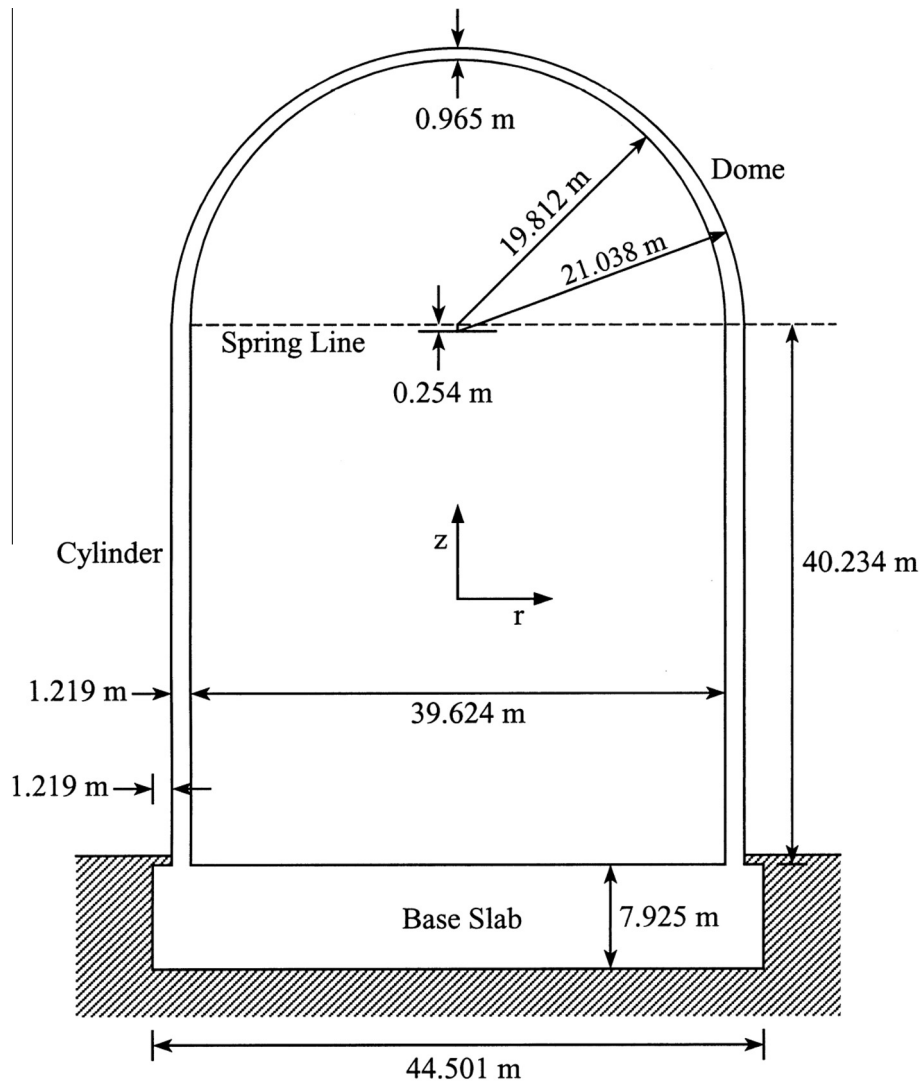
Geometry and dimensions of the PWR prestressed concrete containment of Maanshan nuclear power plant.
